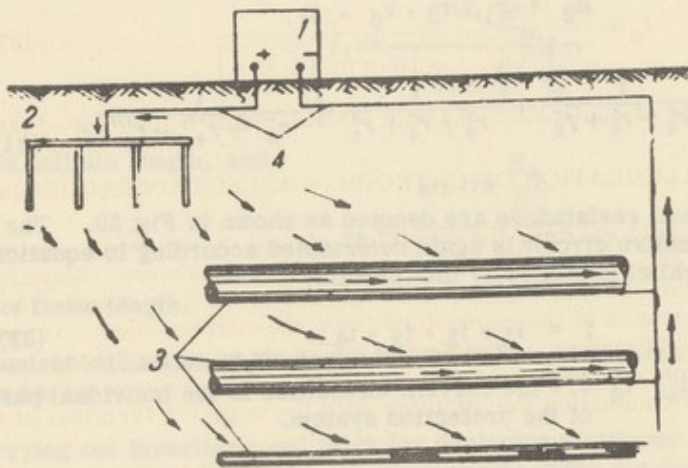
Set-up for cathodic protection of a group of underground structures.
